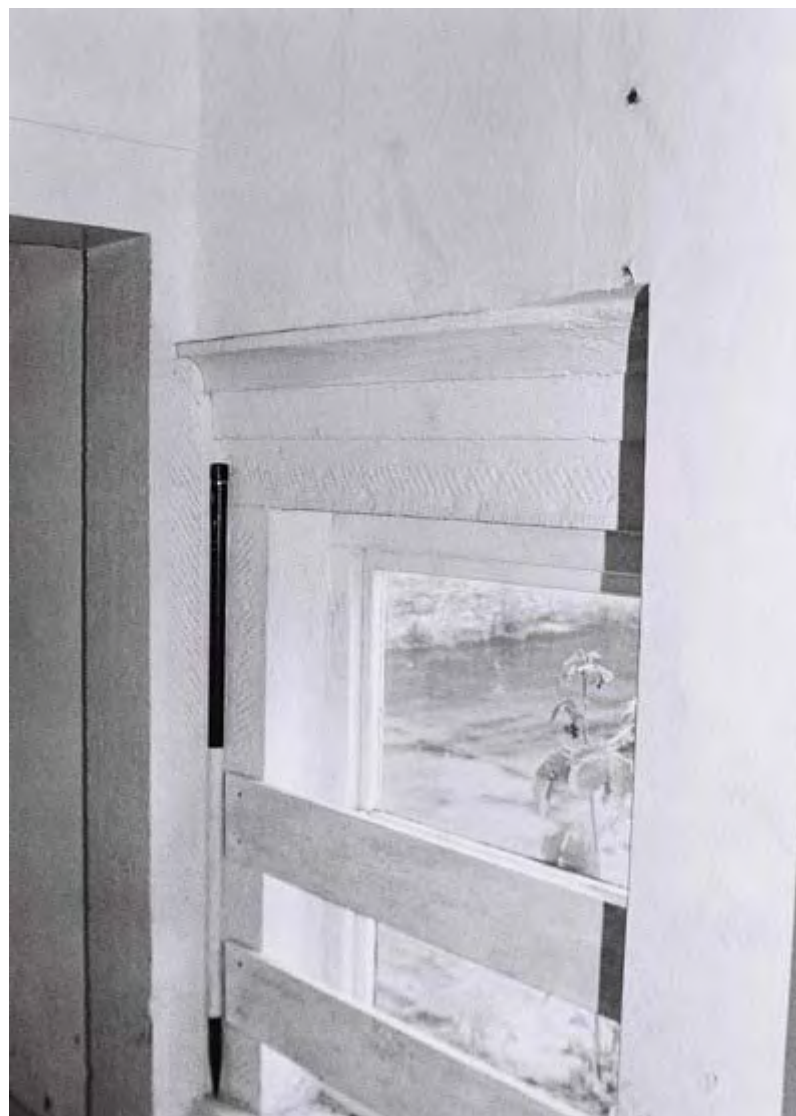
Marsden Park Cottage Interior. First Floor. Facing North.
